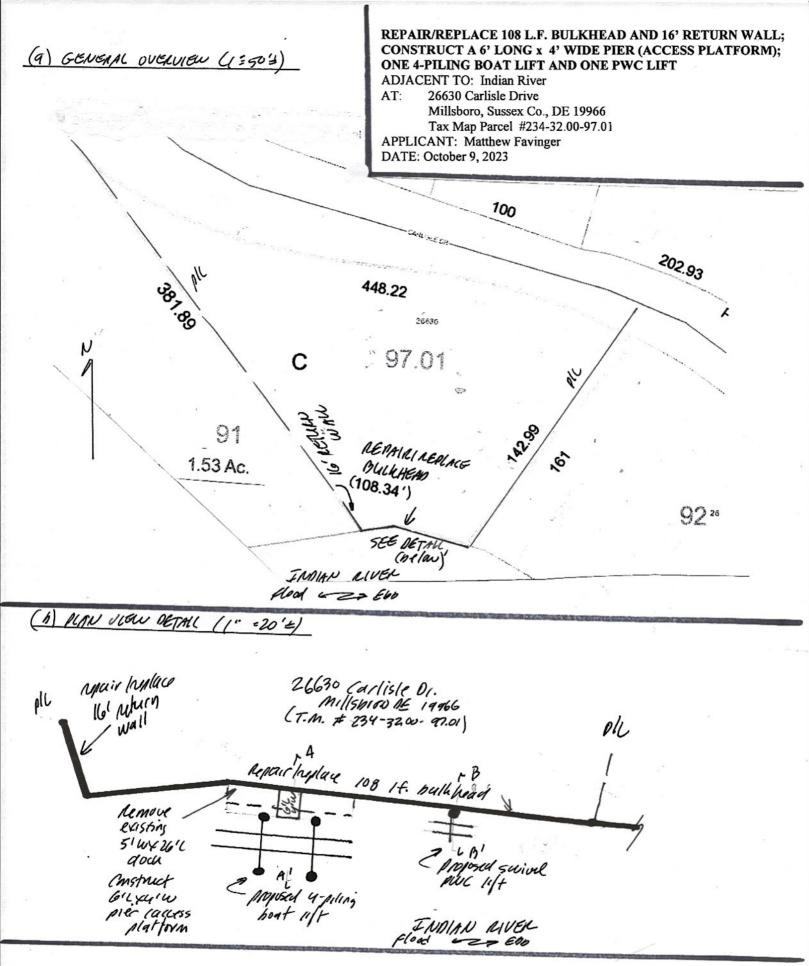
Plan view sketches of proposed project. Sketches for permit application purposes only.
